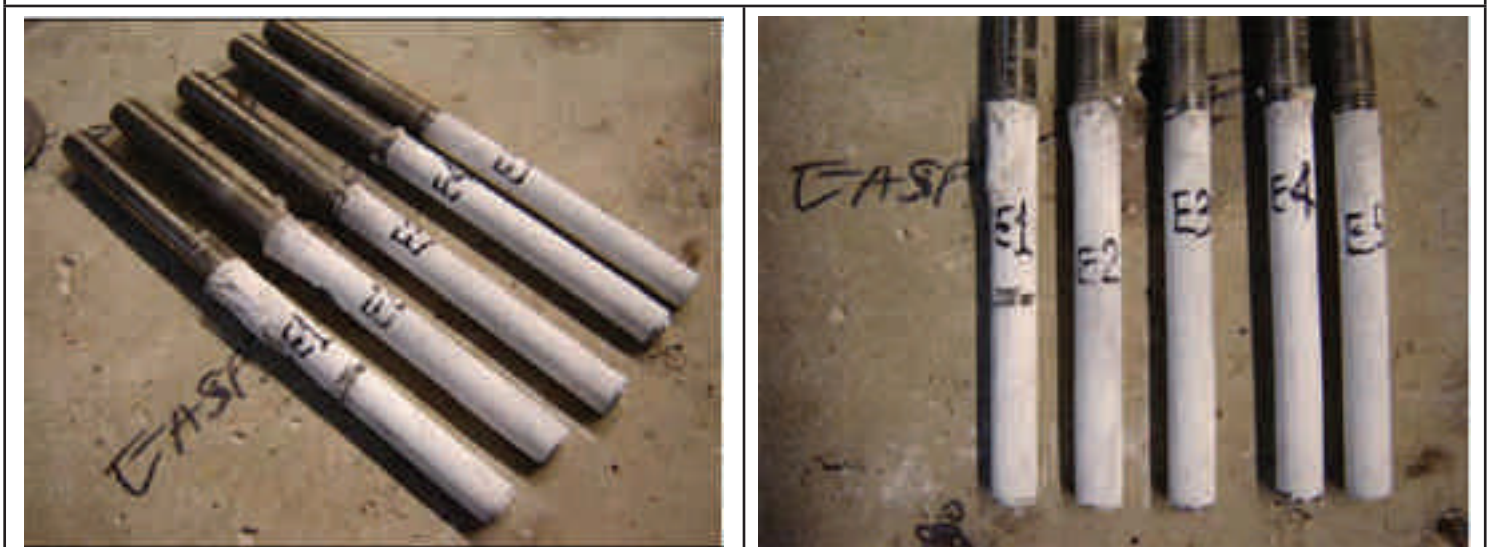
Pull-out failure of Test No. EF20-A1 after tensile loading in dry cleaned holes
